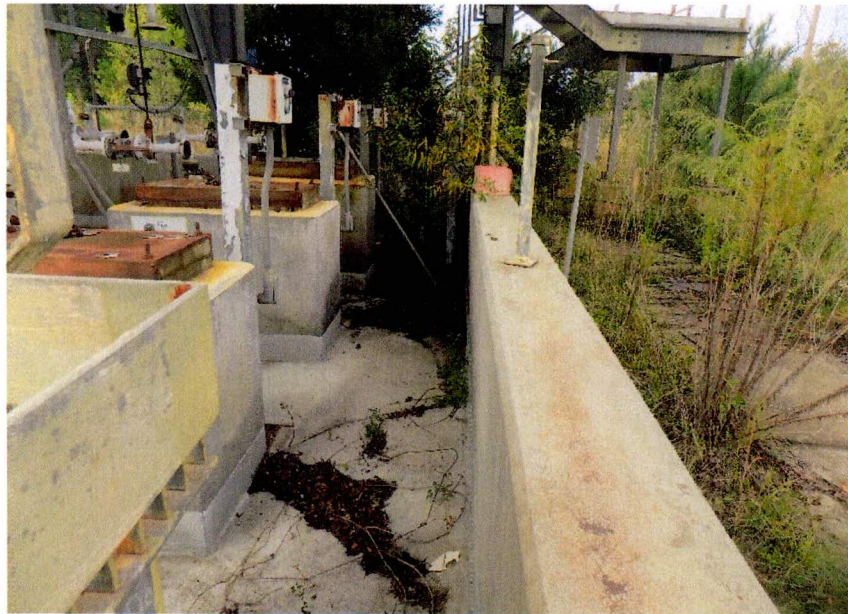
Building 454-D Slab and Sump (Looking West) Before
